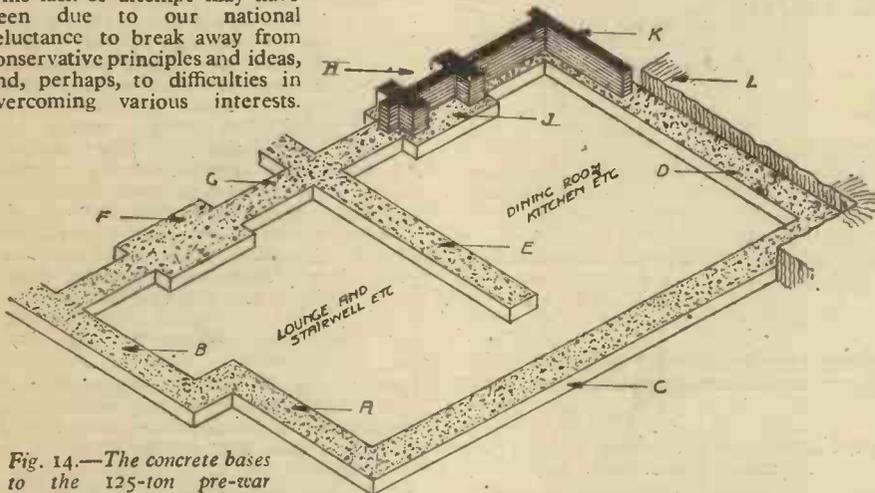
The concrete bases to the 125-ton pre-war house: about 6 yards cube of concrete, 60 feet cube brickwork to bring work up to ground-level, and considerable excavation. A and B—Concrete bases 2ft. by 9in. to front wall and bay. C and D—Ditto to flank and rear walls. E—Concrete base to heavily-loaded partition. F and J—Concrete base to chimney. G—Concrete base to party wall. H—Fireplace. K—Brick wall. L—Ground excavated for bases.
